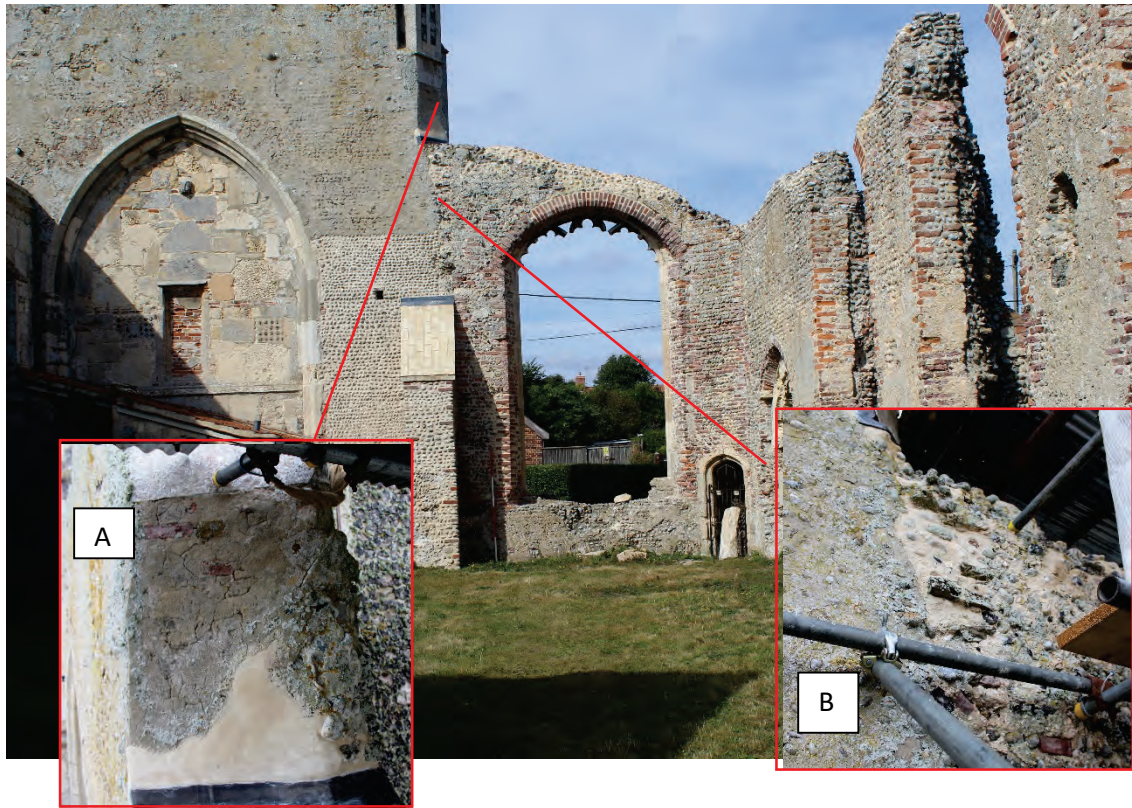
West end of the church showing remains of the clerestory above the aisle wall (*inset pic A*) and projecting broken bricks in the scar of the north respond (*inset pic B*). Note the embedded coping stone denoting the top of the parapet in pic. A
